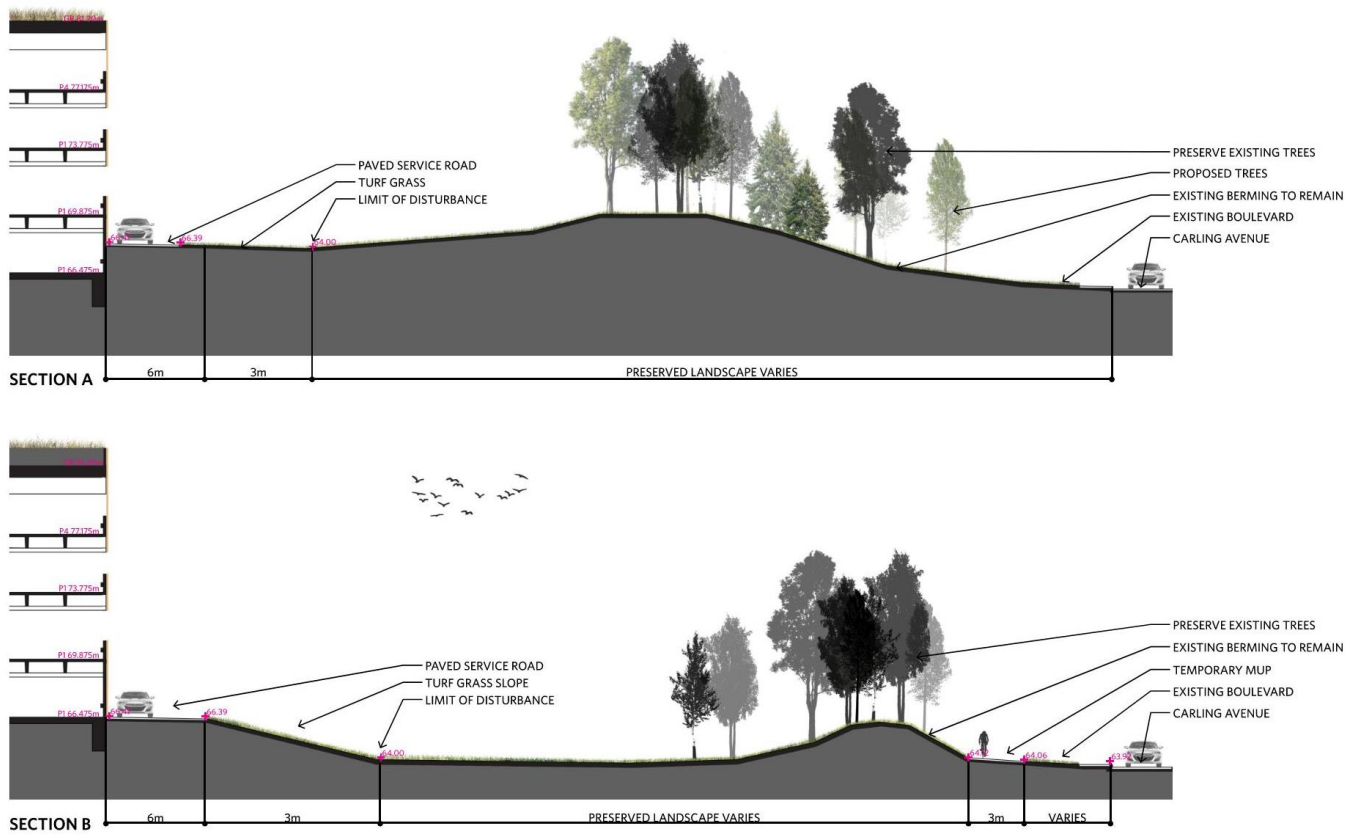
Parking Garage - Sections A and B at Carling Avenue
